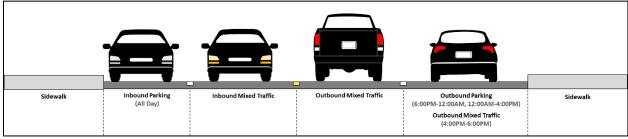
Bayers Road Existing Cross Section (Oxford Street to Connolly Street)
